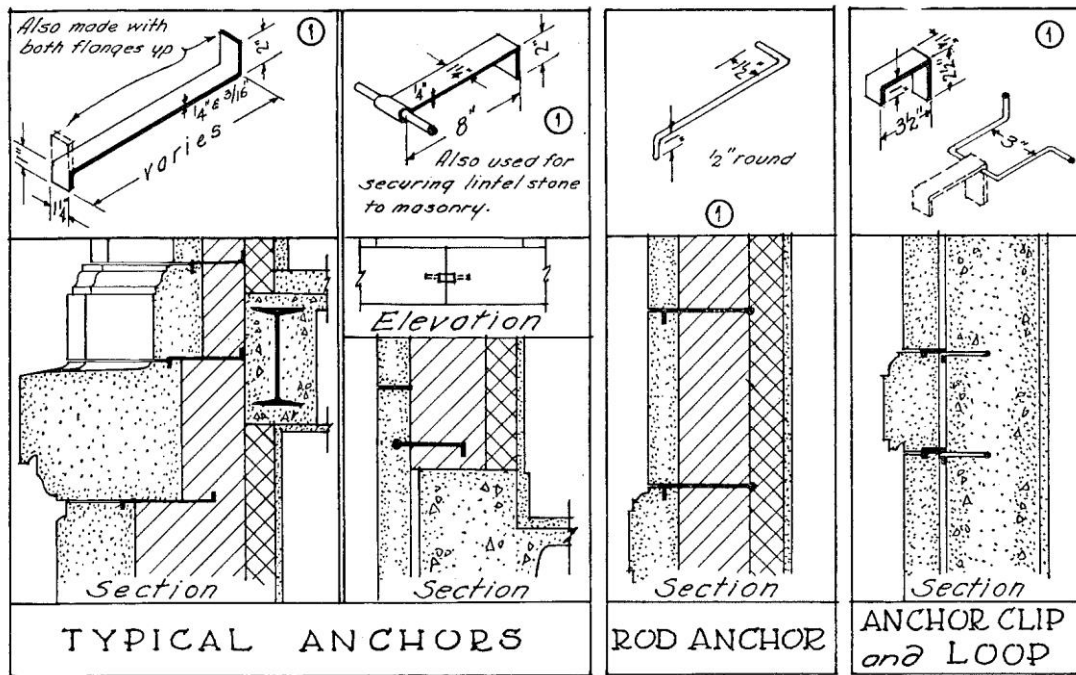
Typical anchors used to secure cut stone facing to an assortment of back-up walls. The flat steel bar with upturned or downturned ends to the left the image, and the rod anchor would both be suitable
